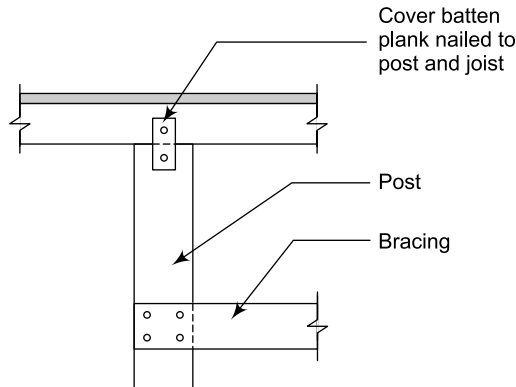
Joining Details of Posts and Joists, and Posts and Bracings.
